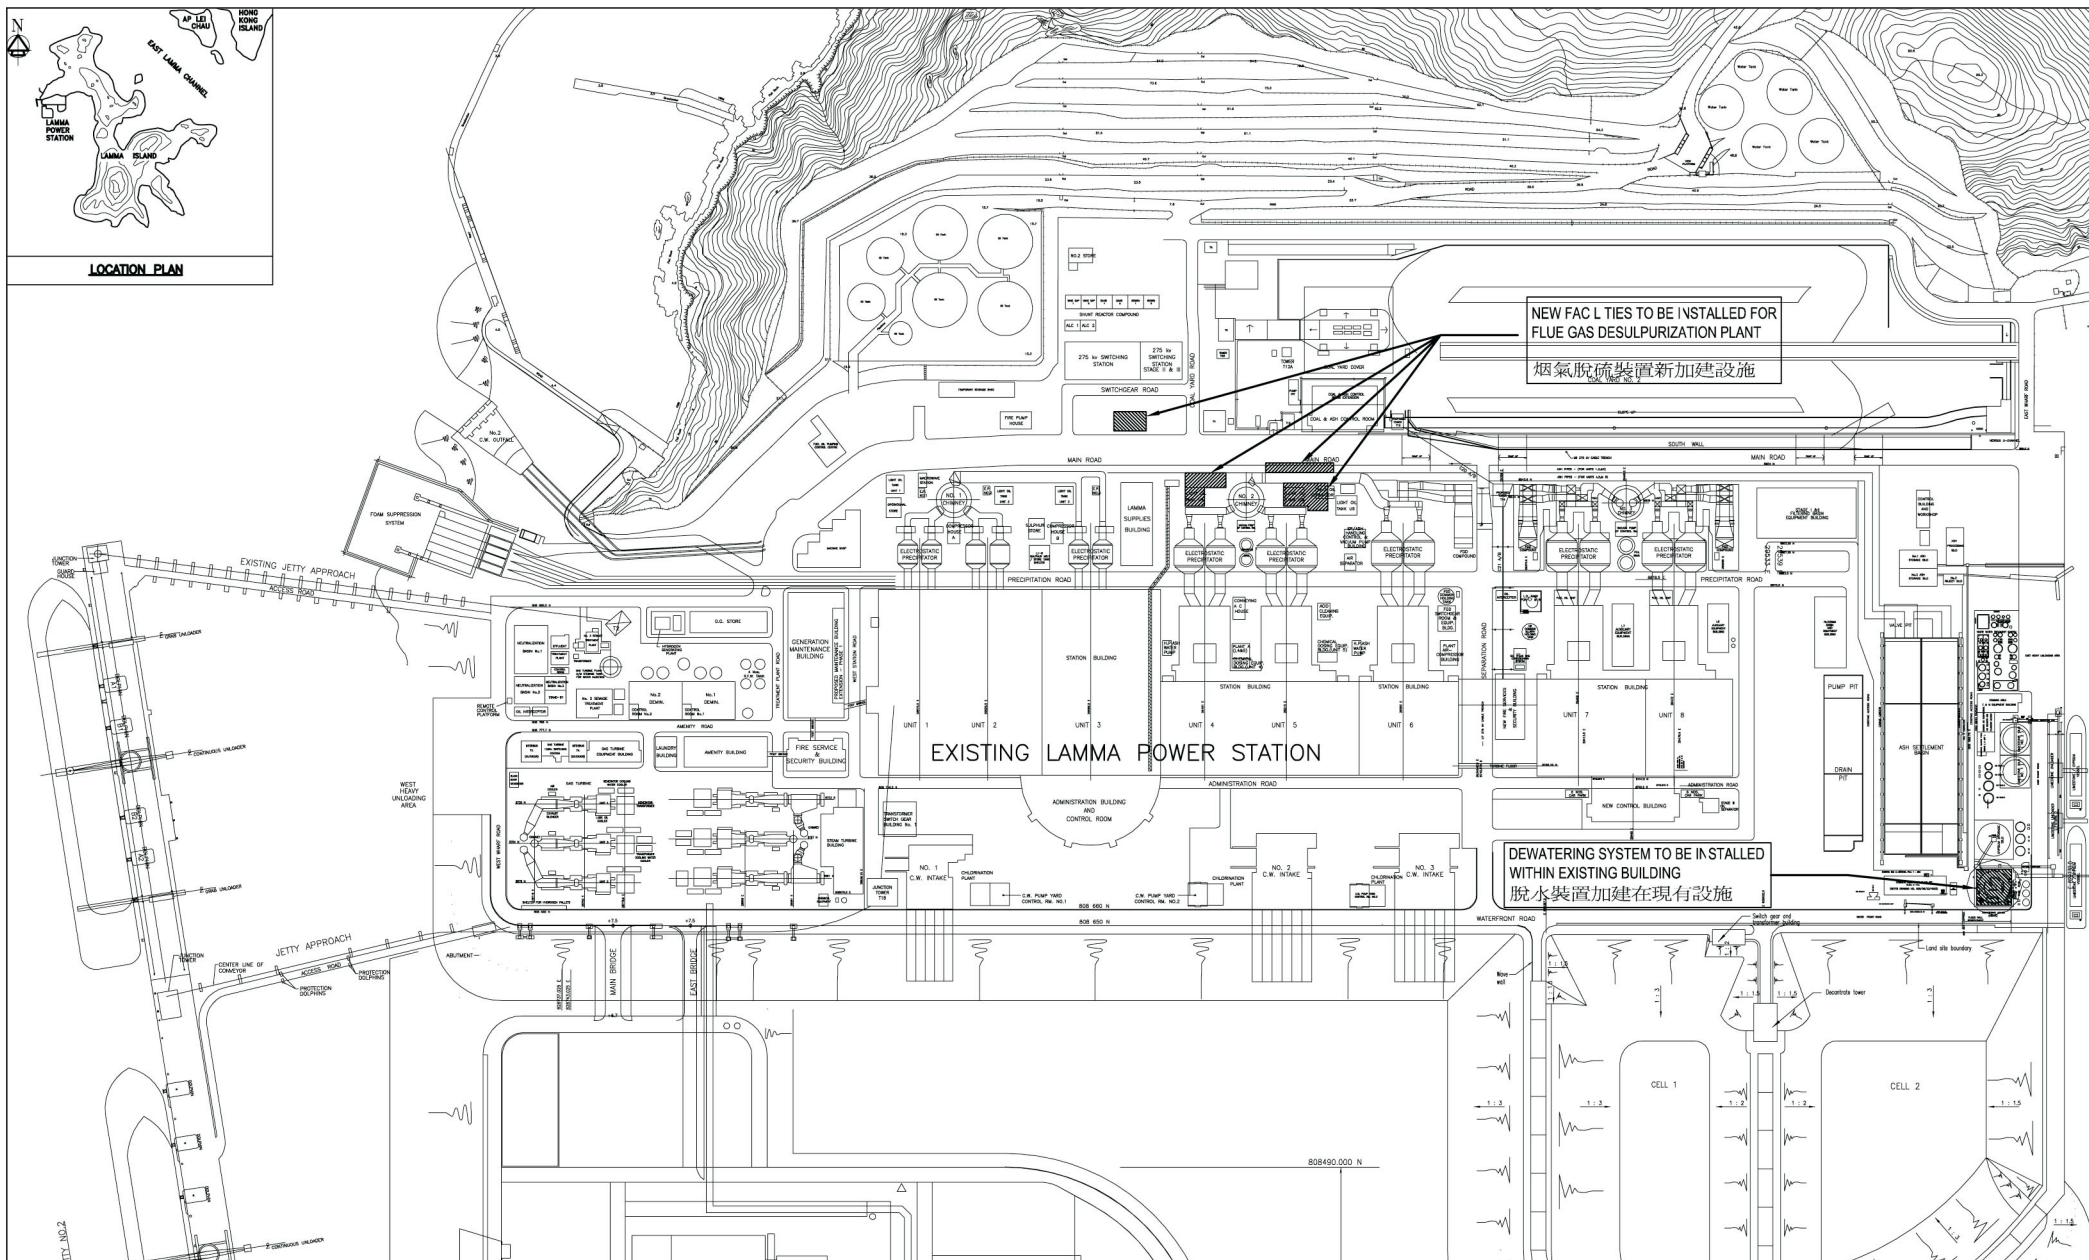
Location of Proposed New Facilities for L4 & L5 FGD Plant
